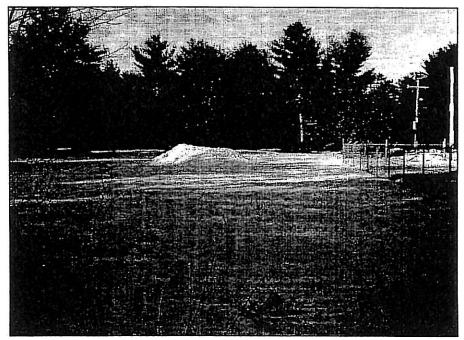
View of existing Laconia Meter Station fencing (right) and proposed additional temporary workspace, view facing southwest.
